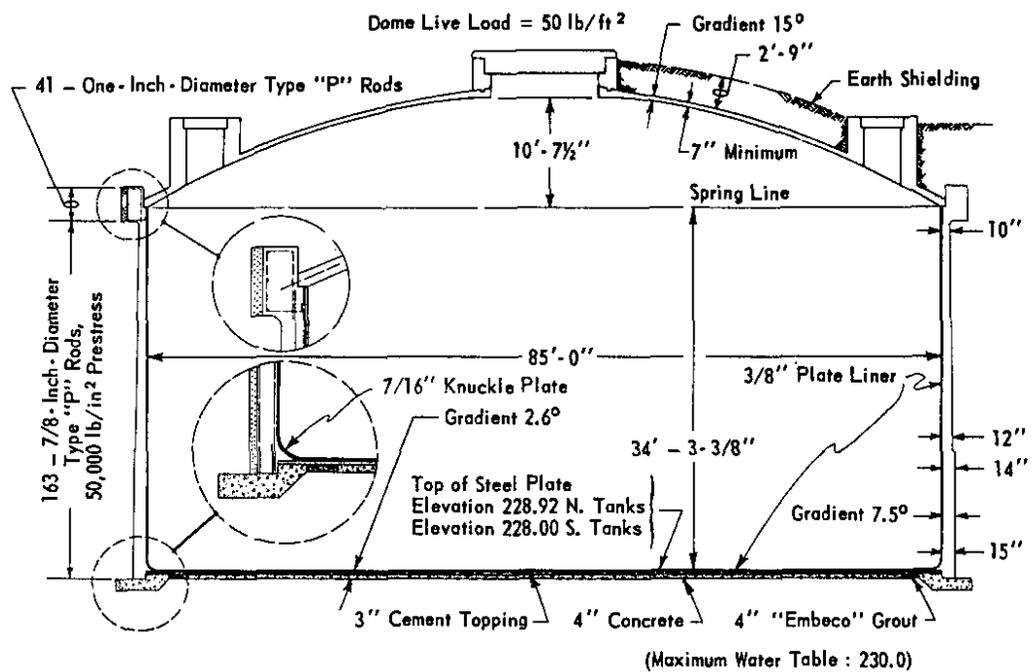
EXHIBIT II WASTE STORAGE TANKS - SECTION AND DETAILS
